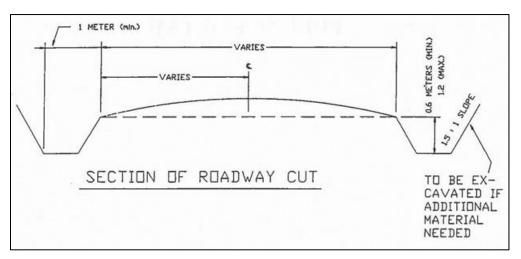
CROSS SECTION OF ROADWAY CUT
